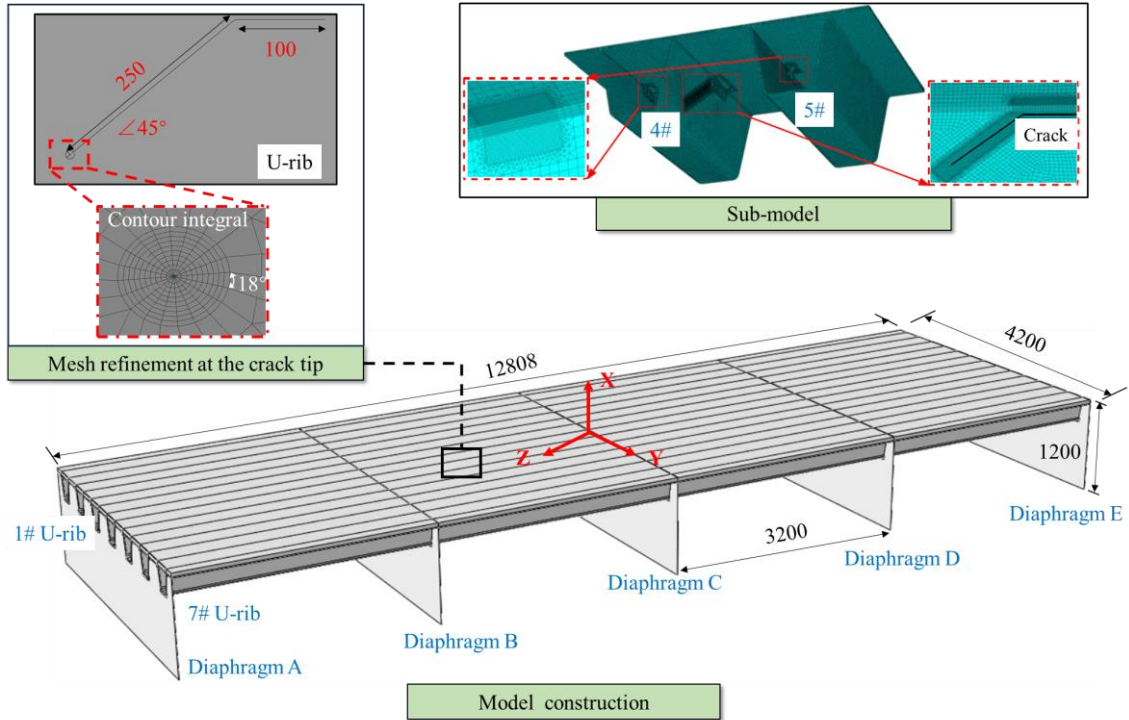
Segmental finite element model with a long crack (Unit: mm)
